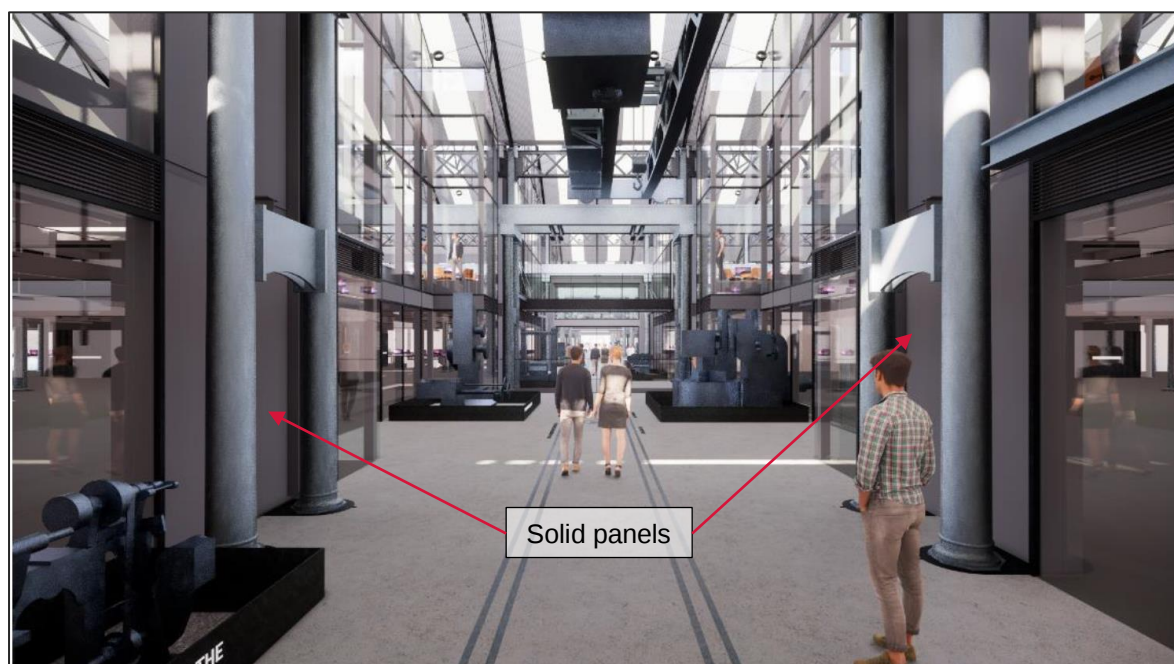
| Originally proposed full height glazing, with solid elements at ground floor and level 1 (Source: Modification Report)
